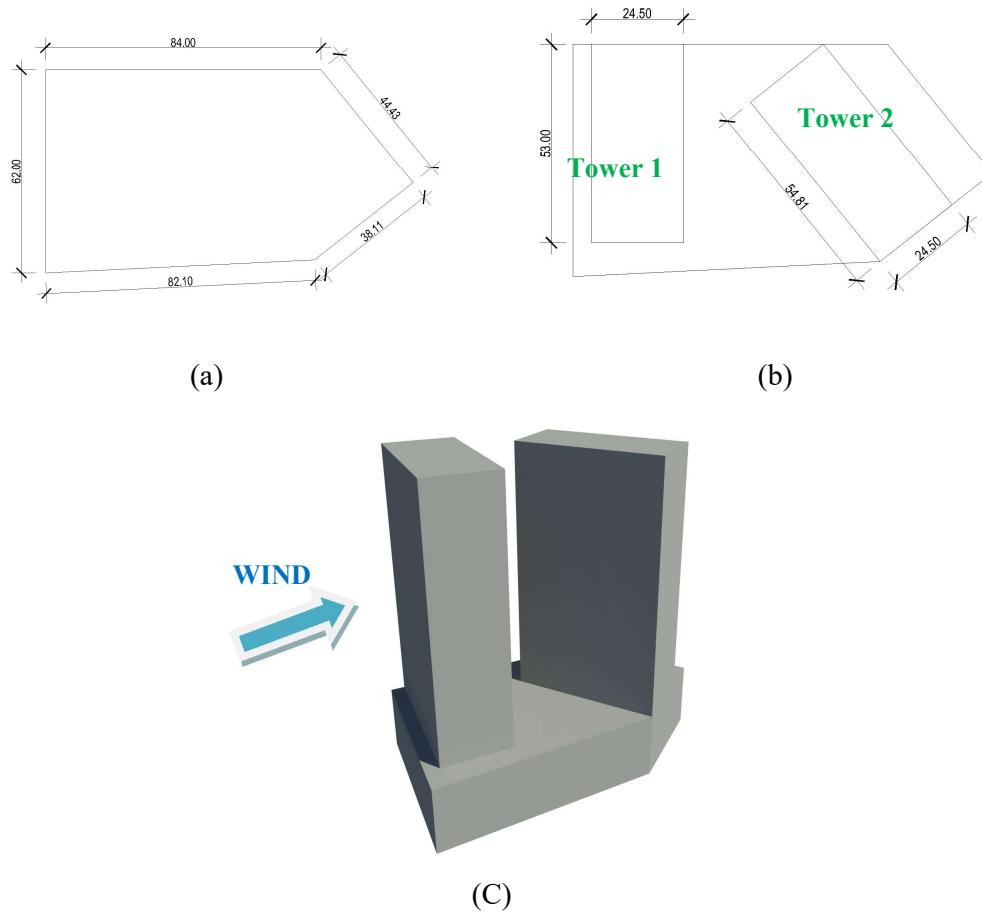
(a) Plan view (0- 6th Floor) (b) Plan view (6th -31st Floor) (c) 3-D view
